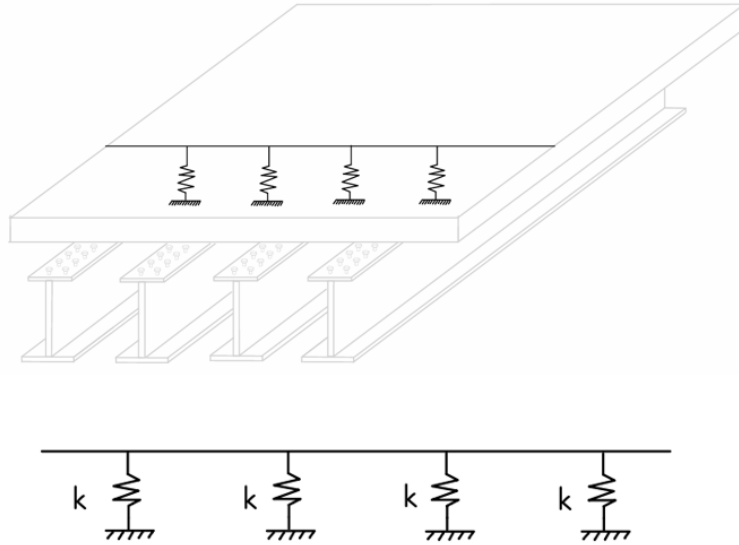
Transverse beam model with vertical springs representing the girders supporting the concrete slab.
